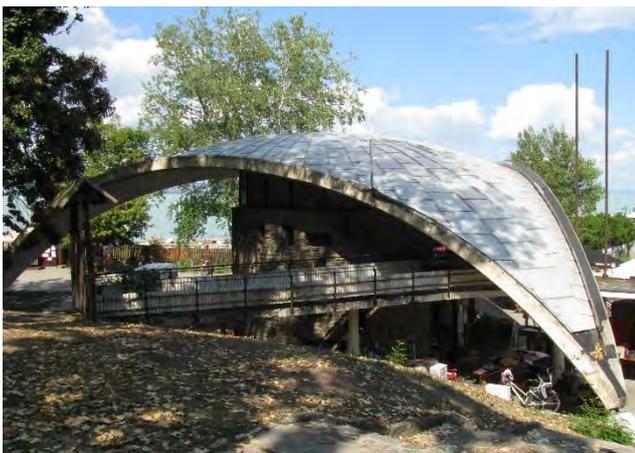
Reinforced concrete shell (2012, Tihany). Photo: the author
